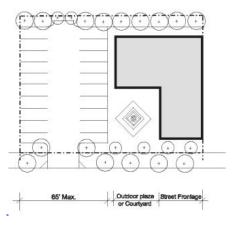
Figure Exception to 20.50.240(A)(1): Example of reduction of the building frontage in order to create an outdoor plaza.
